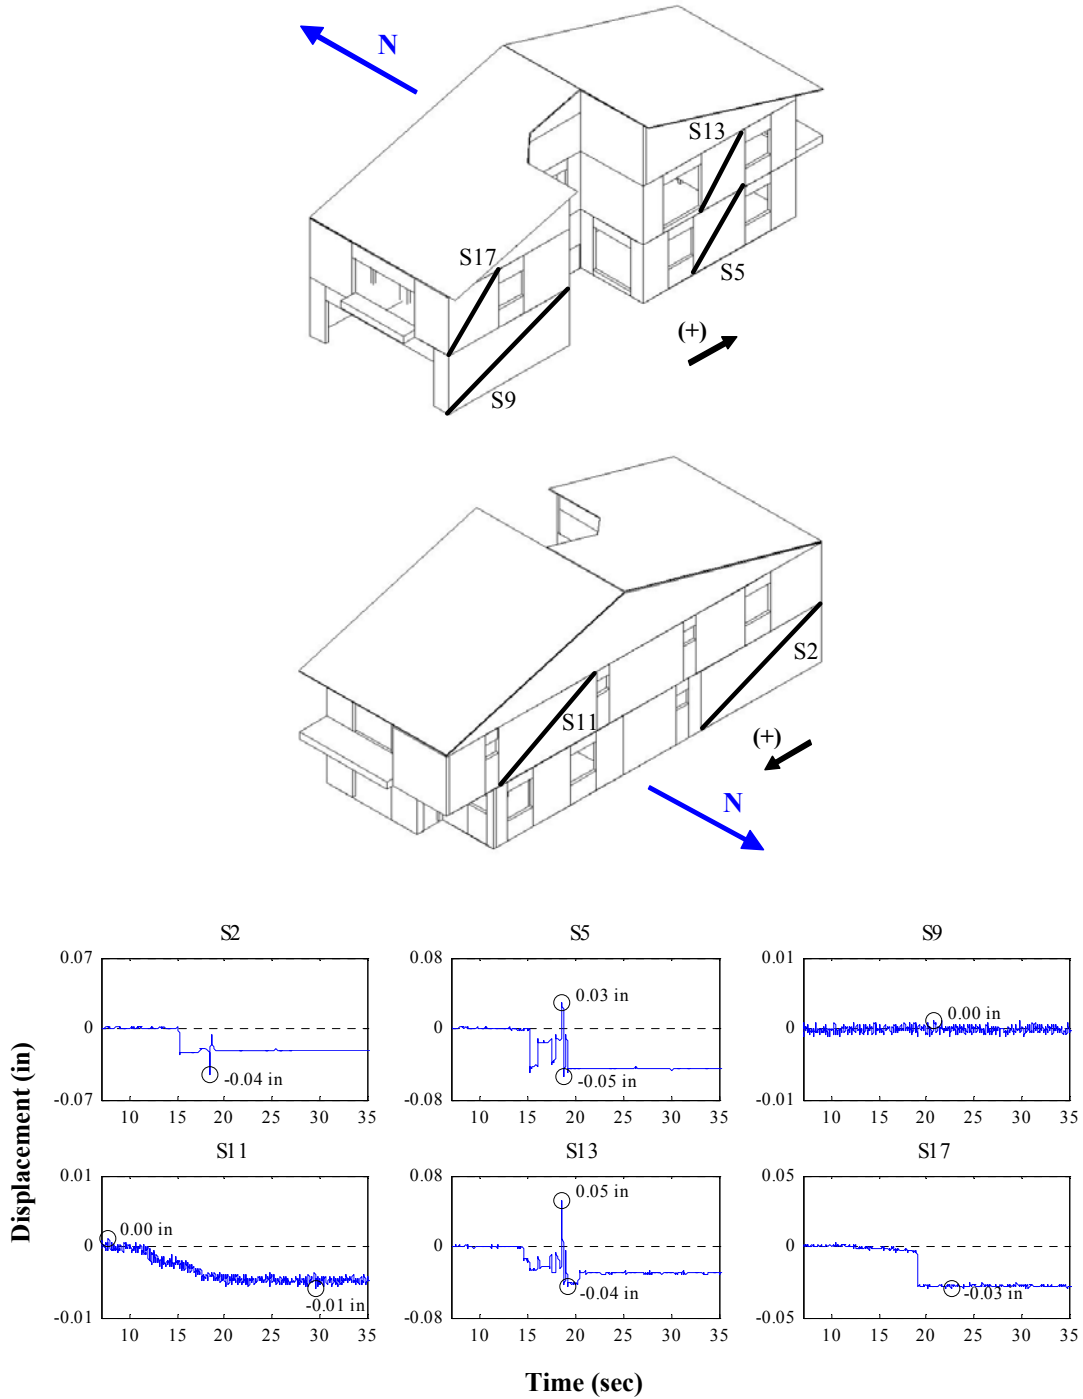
Wall deformations of east-west external walls for Test NWP3S03
